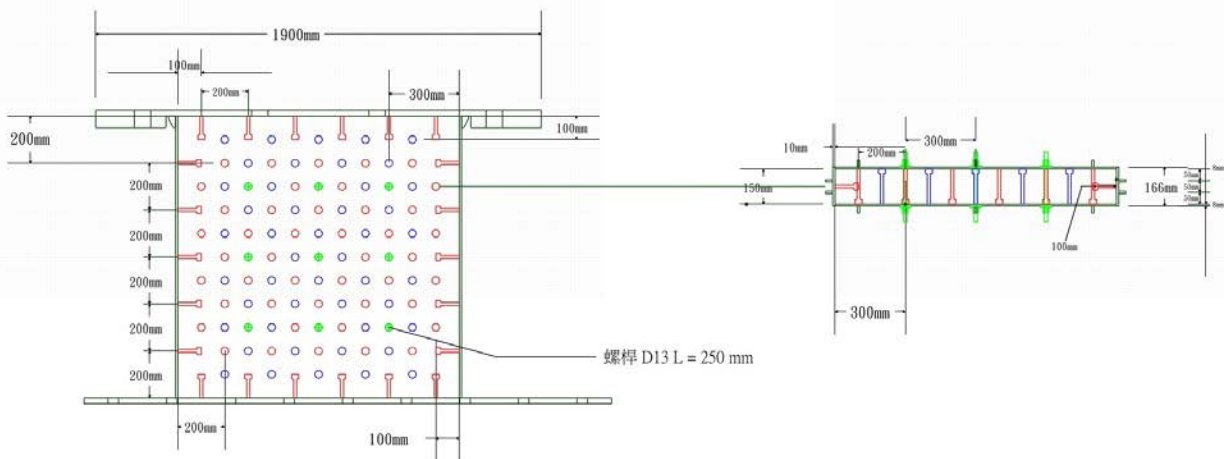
Graph shows the pattern of shear studs in inner wall for specimens with studs spacing of 20 cm
